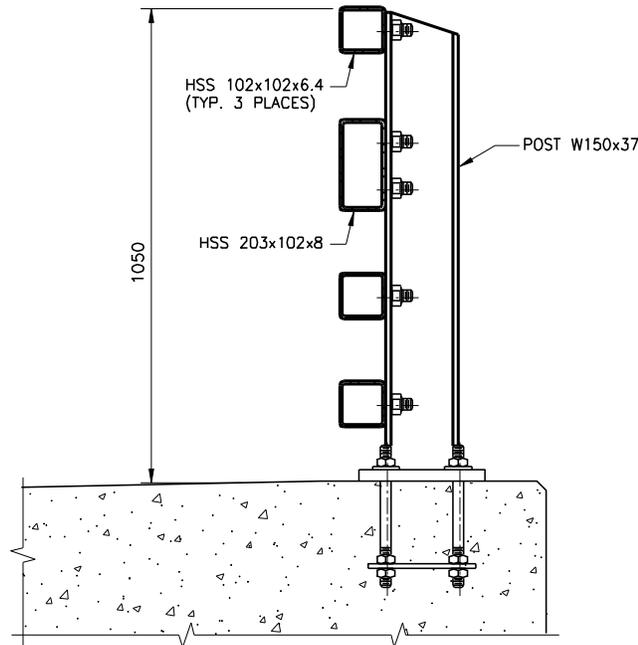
Four Tube Railing on Sidewalk (TL-4)
